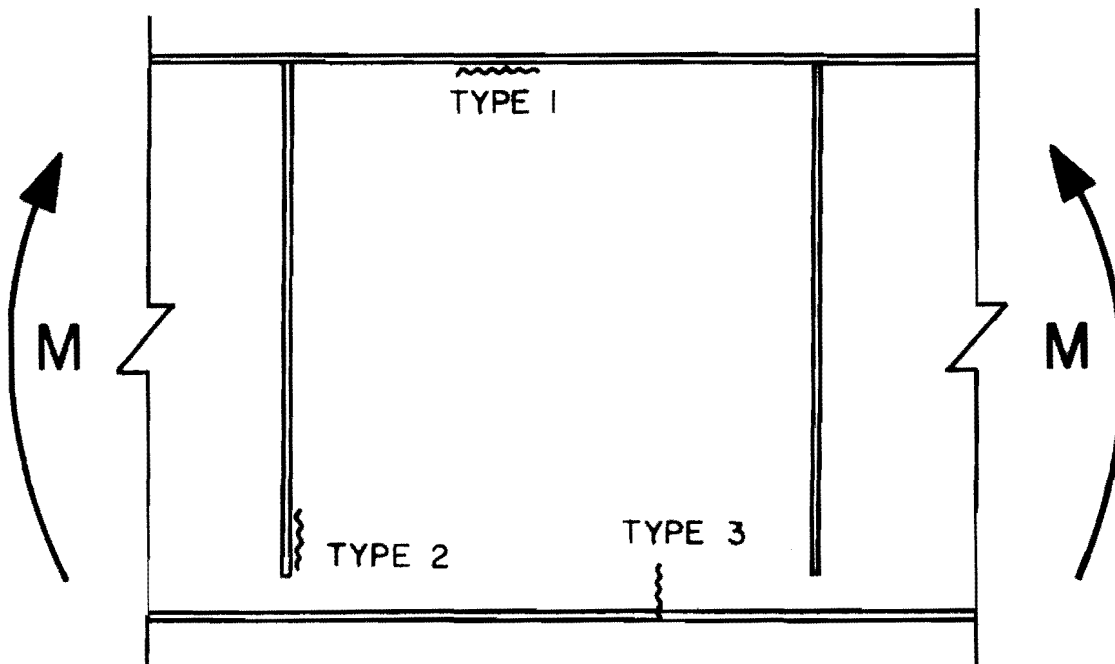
TYPES OF FATIGUE CRACKS FOR PURE BENDING SPECIMENS
